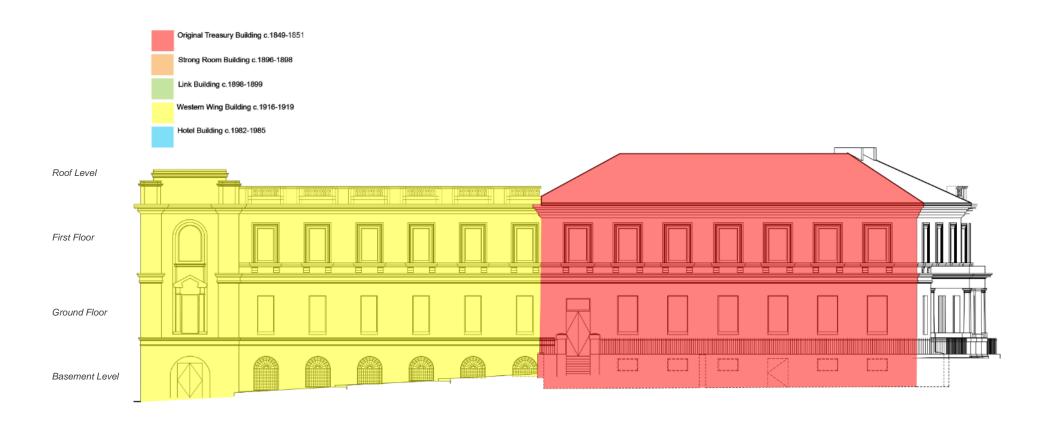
Extract of 'as built' plans showing period of construction – Bridge Street elevation. Note that the entrance steps to the Bridge Street elevation of the Original Treasury Building were reconstructed in the 1980s, however they are shown in 'red' above, to indicate that they were an original element to the building.
